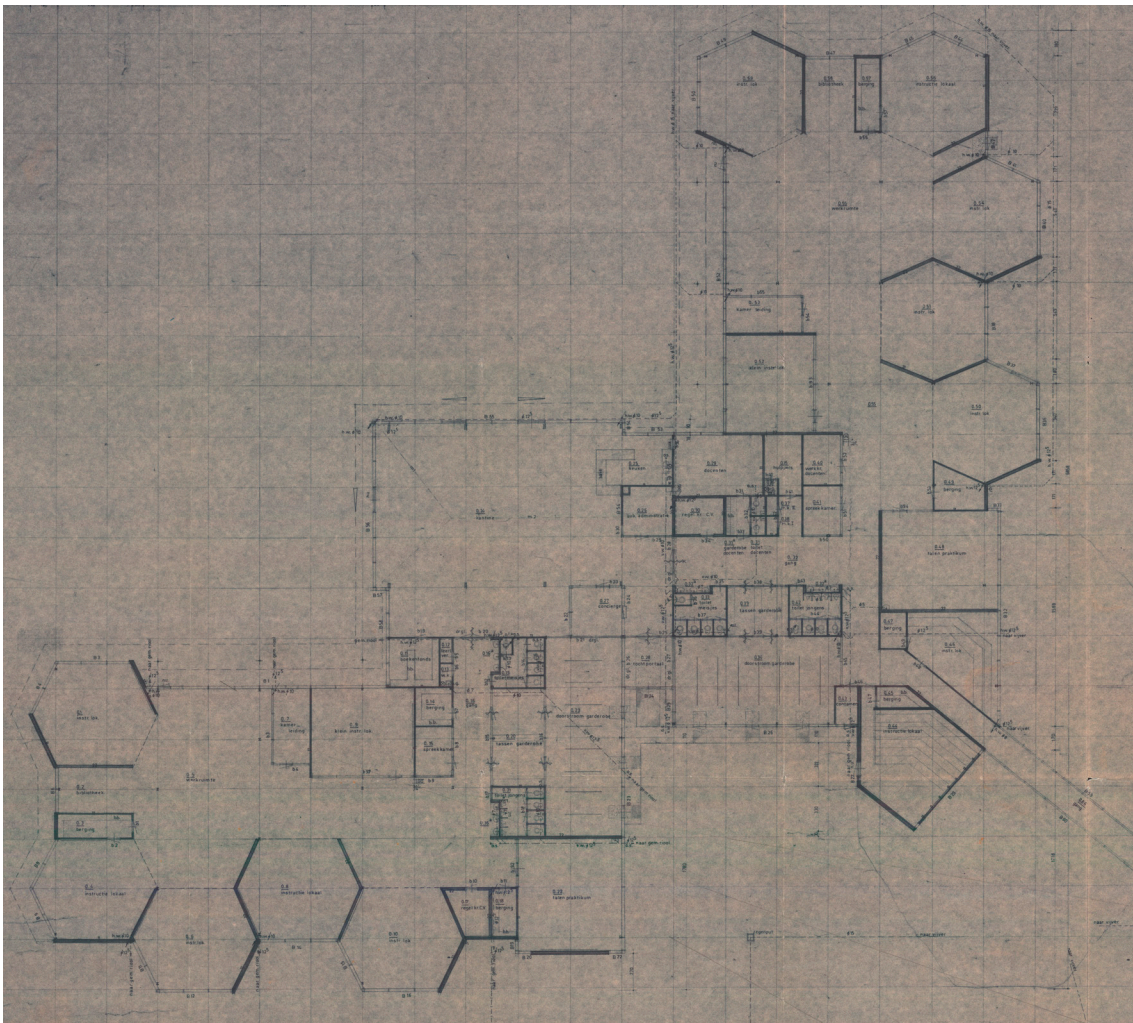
Floor plan Building 1. (Source: Bouwarchief Amsterdam Nieuw-West, J.B. Ingwensen Architect B.N.A., 1974)
